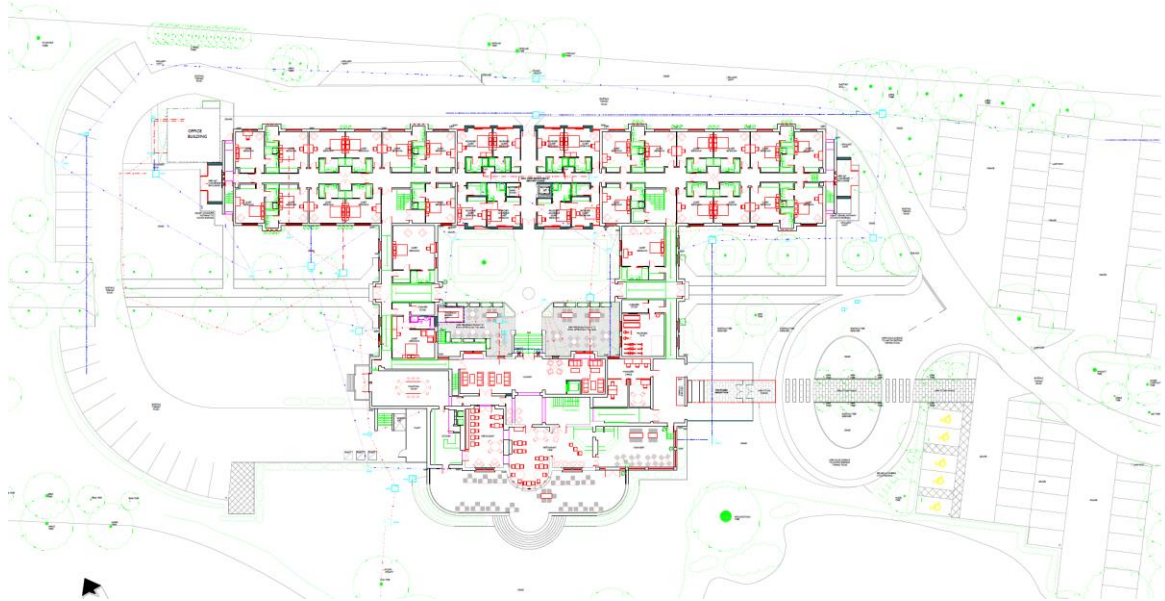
Extract of approved Ground Floor Plan (LPA ref: S/4502/17/FL)
